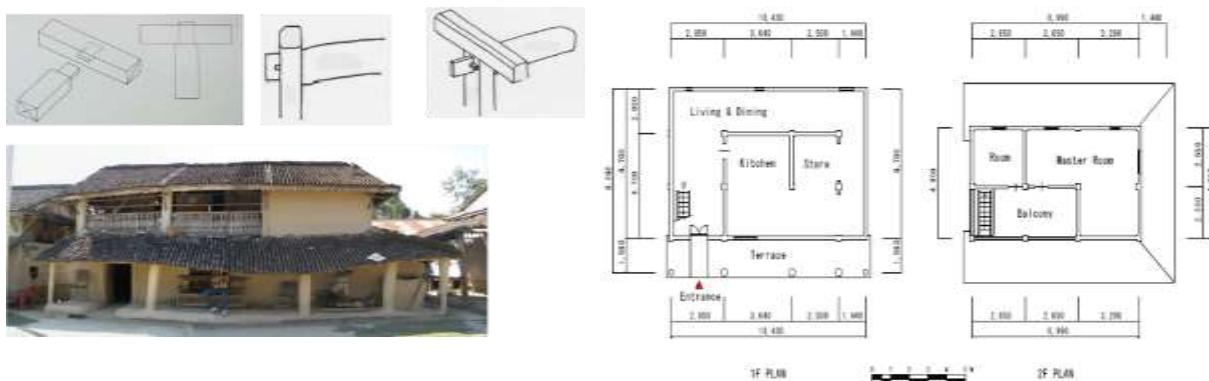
Traditional thatched house with traditional joints of Post-Beam Structure
